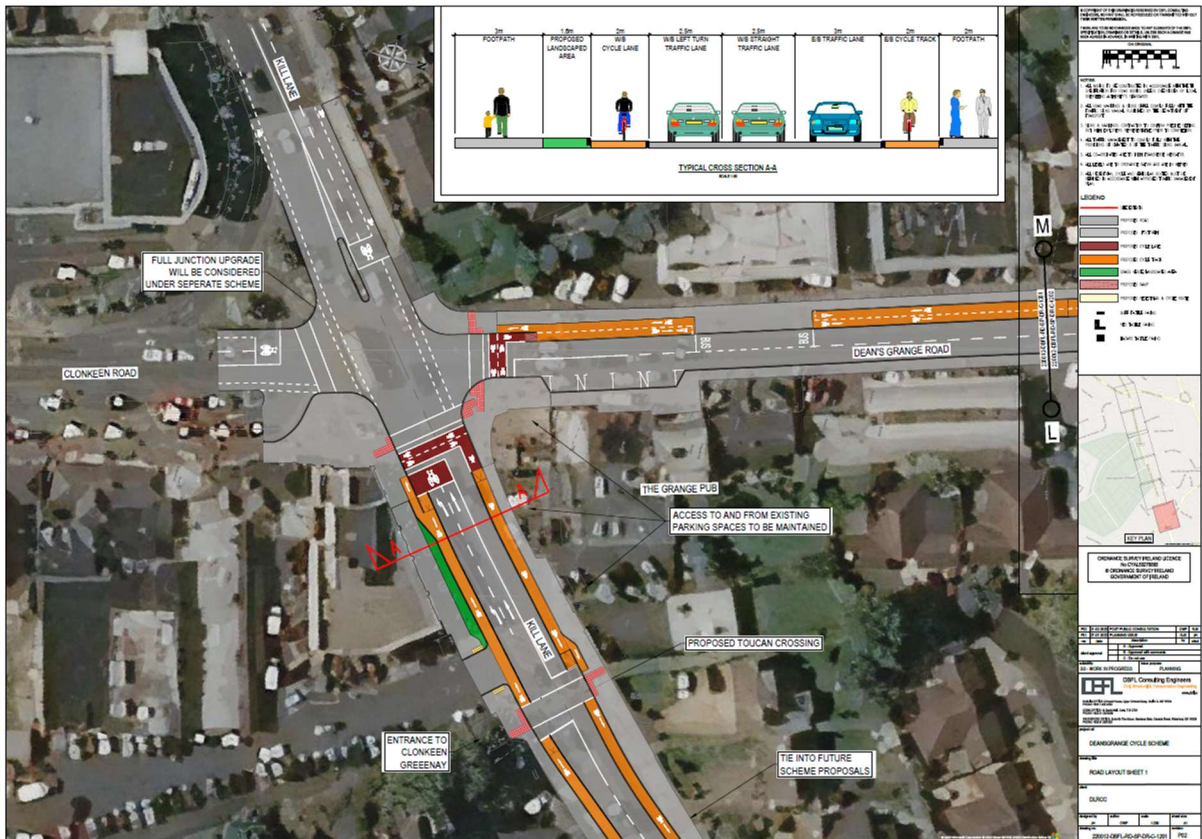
Outline design and layout of proposed scheme- Section 1 (source: DBFL Consulting Engineers)
